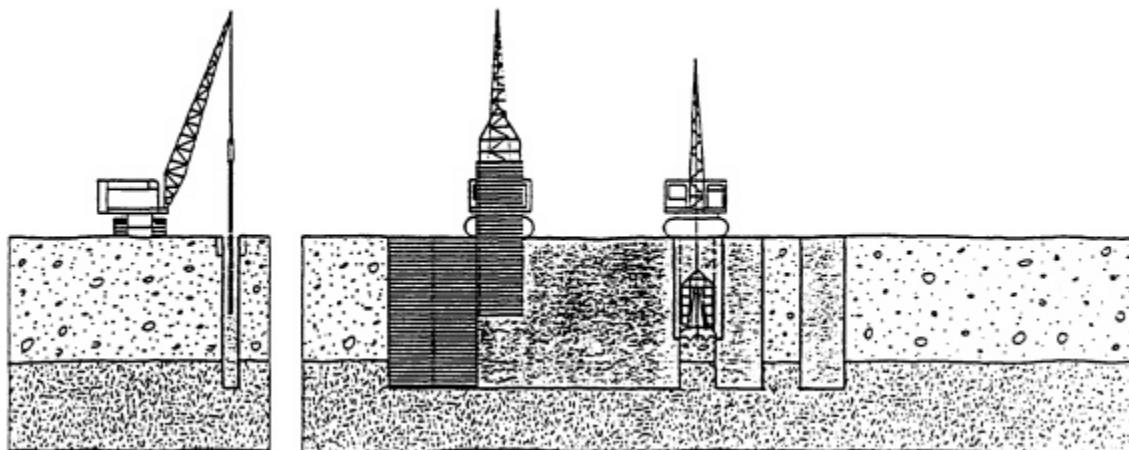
Installation of HDPE membrane in a cutoff wall excavated with self-hardening slurry.
